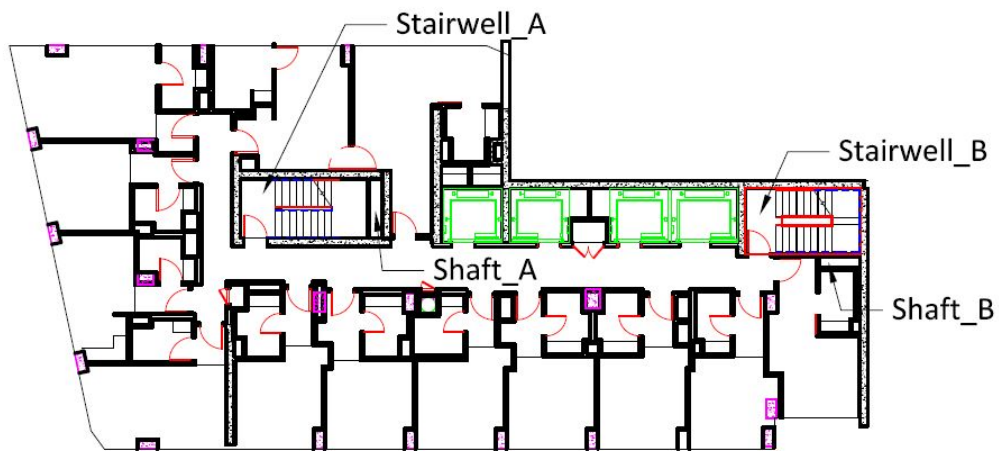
18th through 27th floors layout has 13 bedrooms and 13 bathrooms
